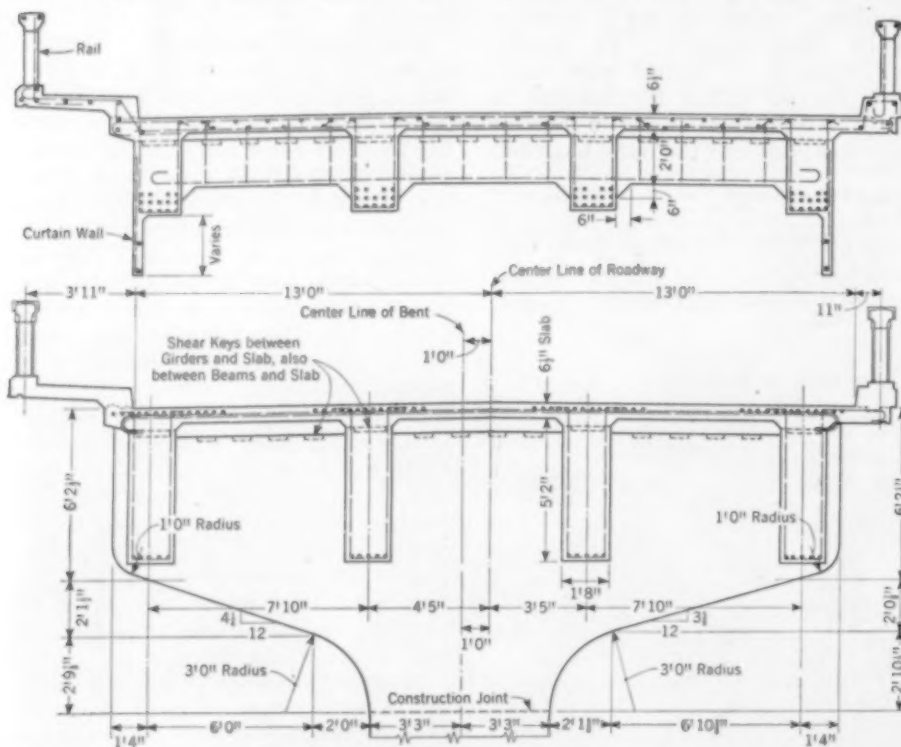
TYPICAL SECTIONS THROUGH BRIDGE DECK AT COLUMN AND NEAR CROSS BEAMS
